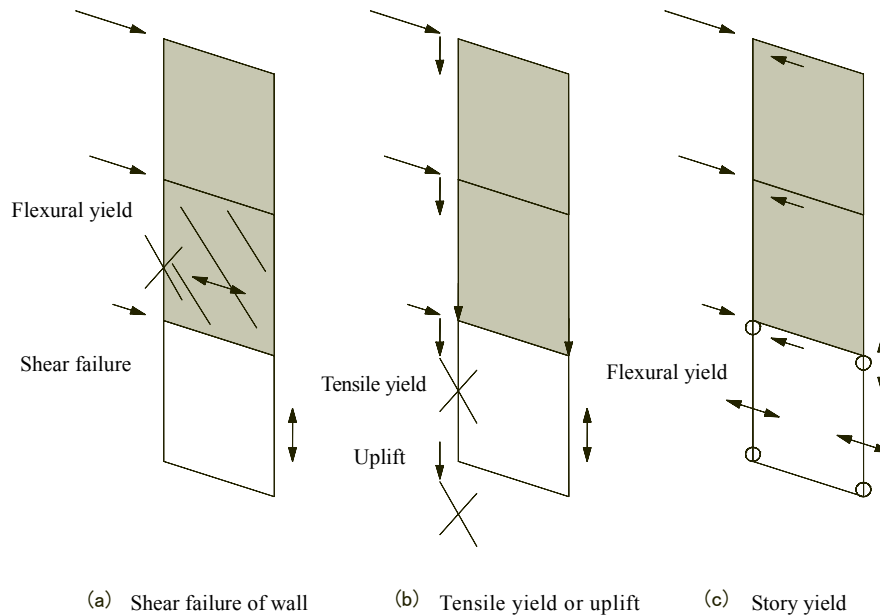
Collapse mechanism of the frame composed of the columns supporting the wall above
